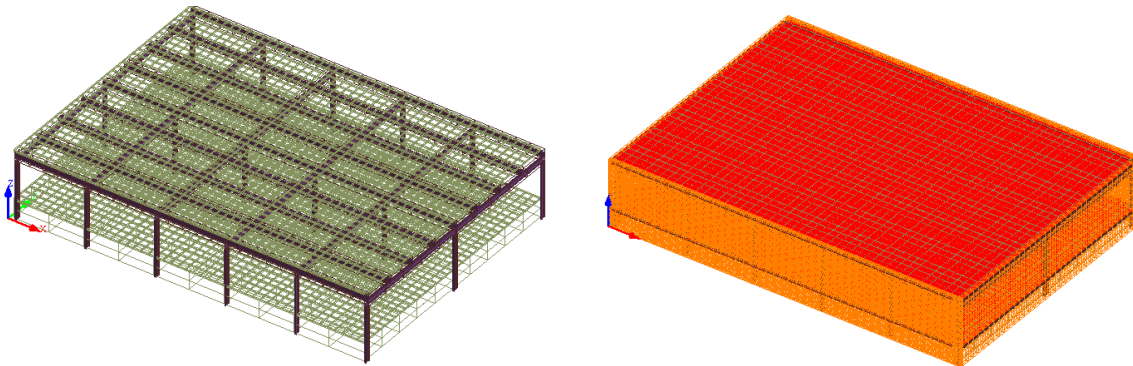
ELS model for the steel structure, the top slab, slab on grade and the barriers
